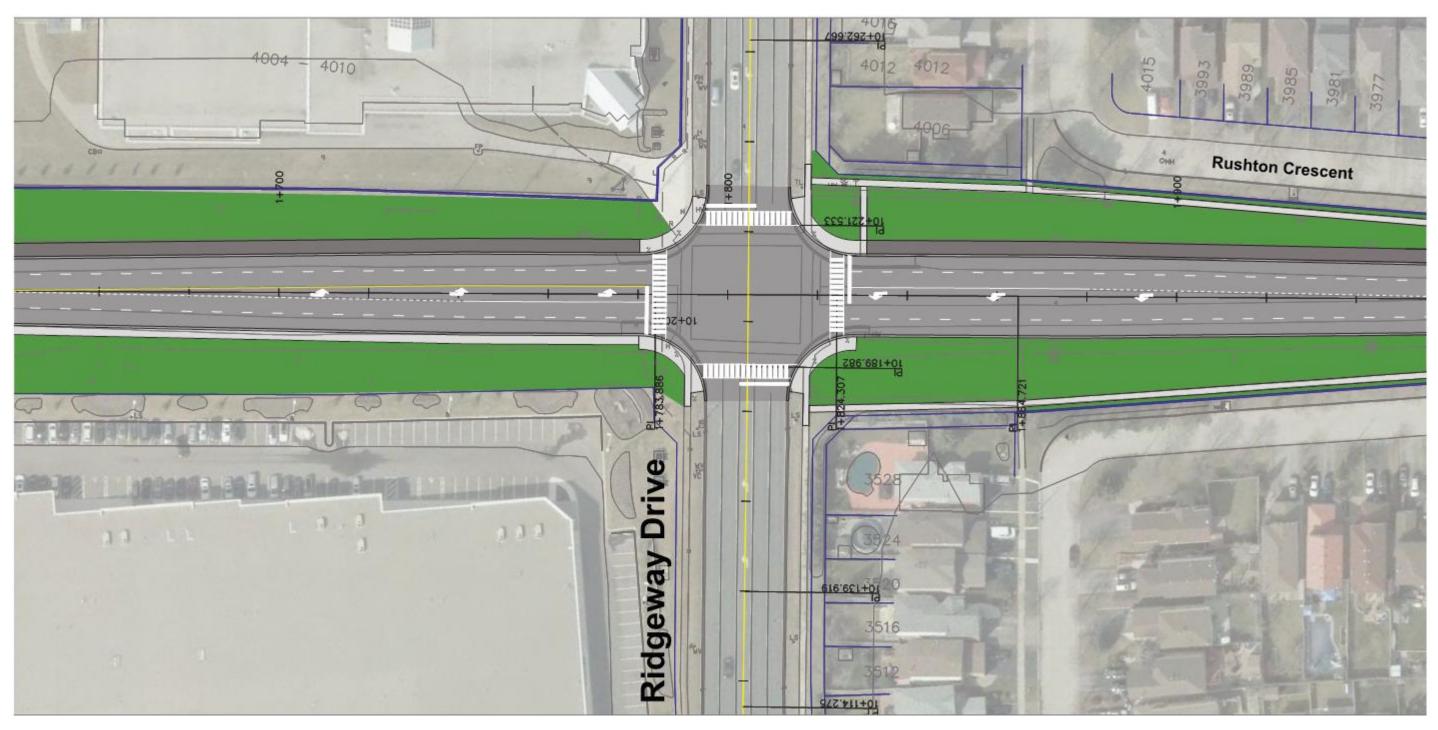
Alternative Design Concept #2 - Widen Burnhamthorpe Road West to 4 Lanes (No intersection Improvements at Ridgeway Drive)
